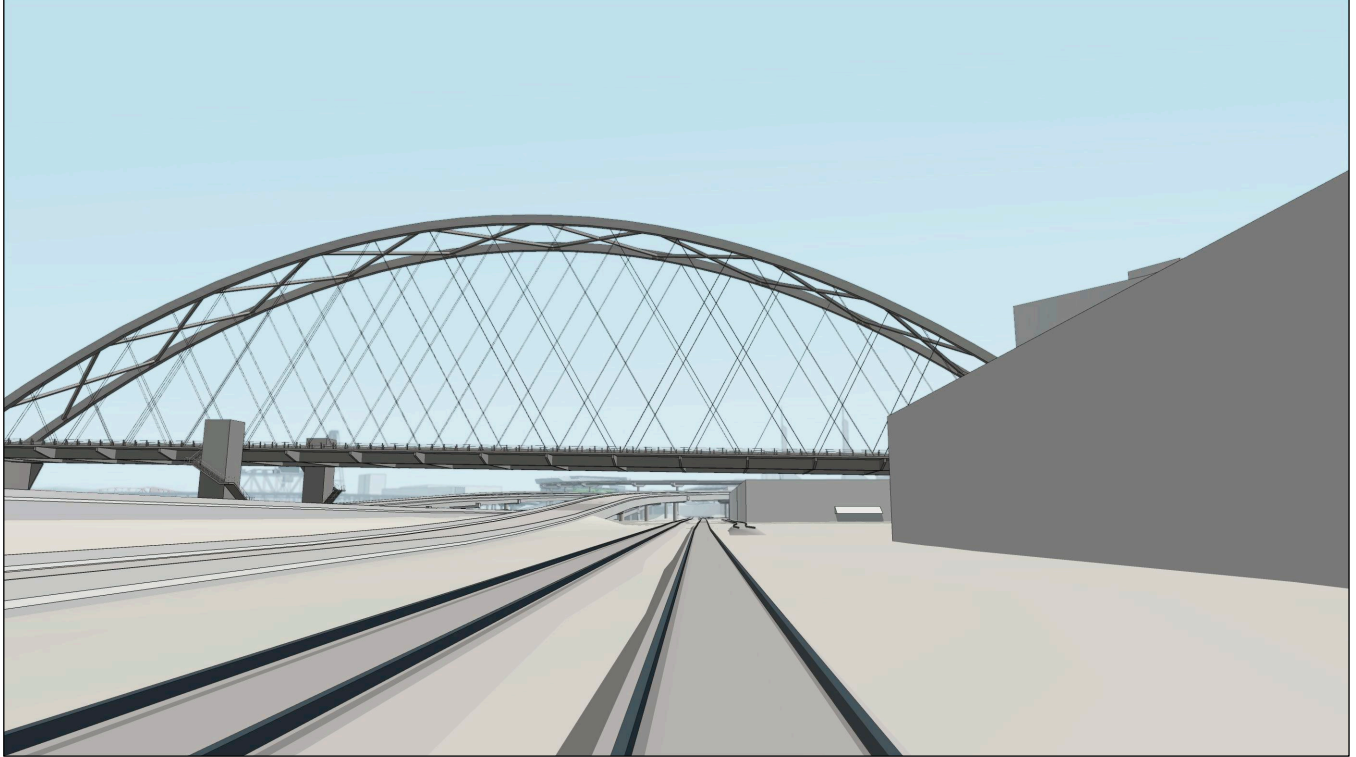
Oregon & California RR (UPRR) alignment looking north toward the Burnside Bridge undercrossing, artist's rendering of proposed new eastern approach with tied-arch structure (Fat Pencil Studio, 2021).
